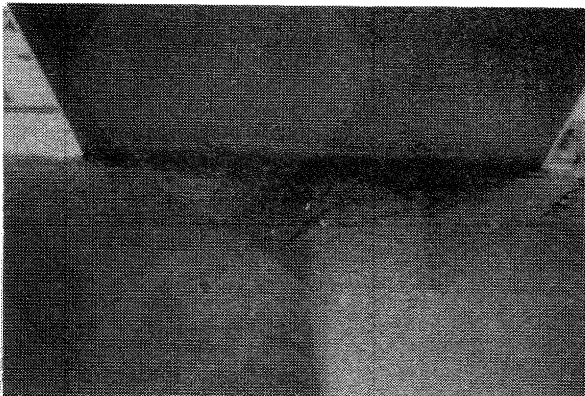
DAMAGE TO PERIMETER COLUMN SLAB CONNECTION
